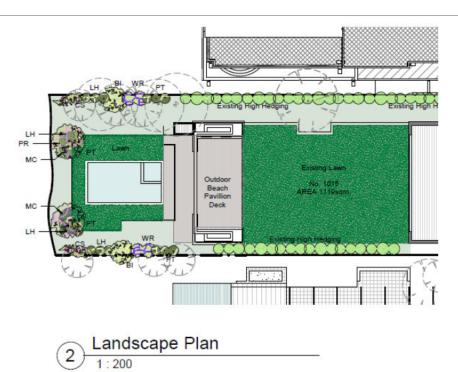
Landscape plan depicting new plantings on the shared boundary with 1013 Barrenjoey Road. No details of the height at maturity of new plantings have not been provided.
